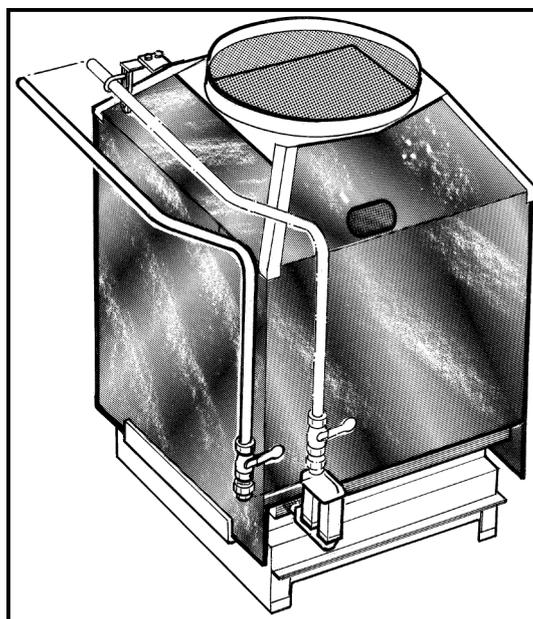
shows the pipe clamp fitted to Purewell 60, 70, 80 and 120 kW boilers.
